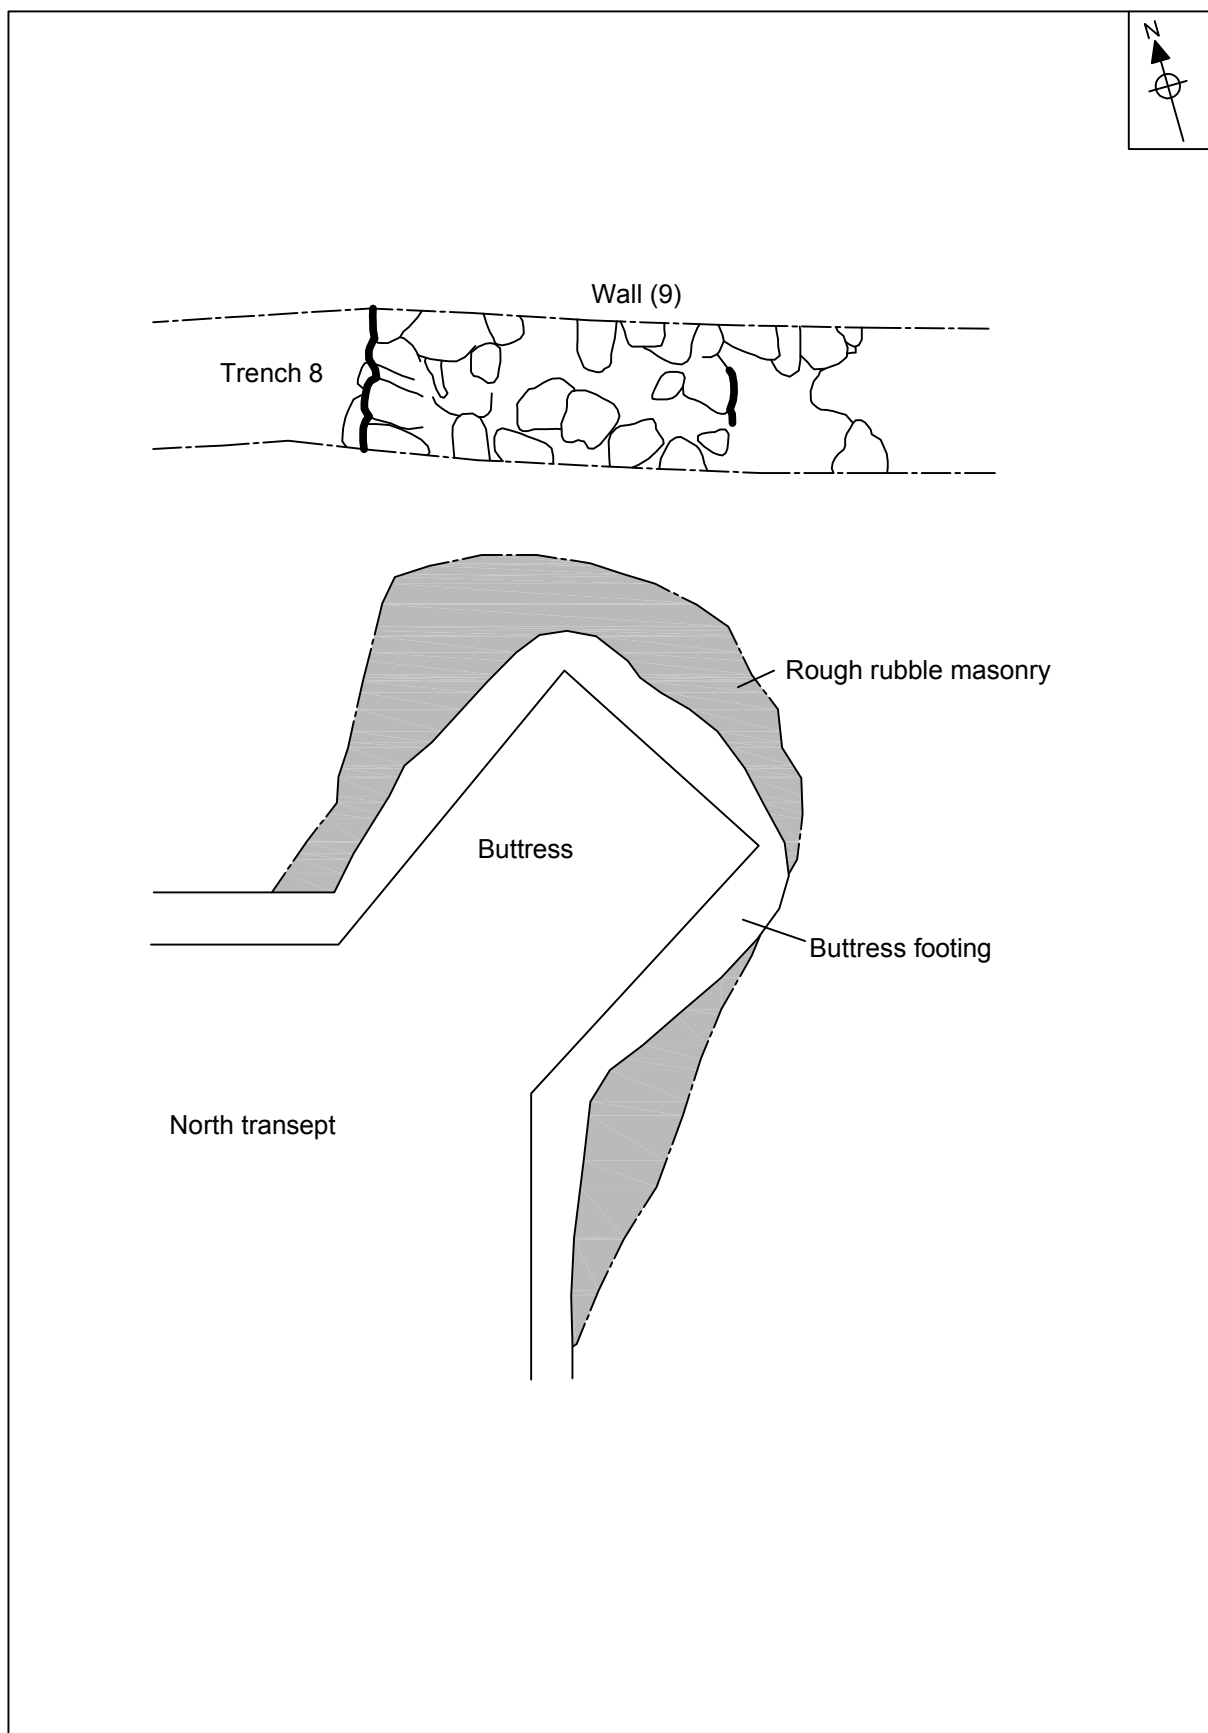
Plan showing wall (9) in relation to north transept. Scale 1:20.
